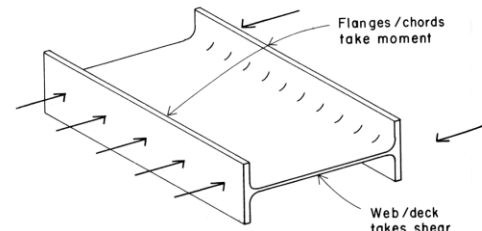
Flanged and webbed beam analogy for a horizontal, wood-framed diaphragm.
